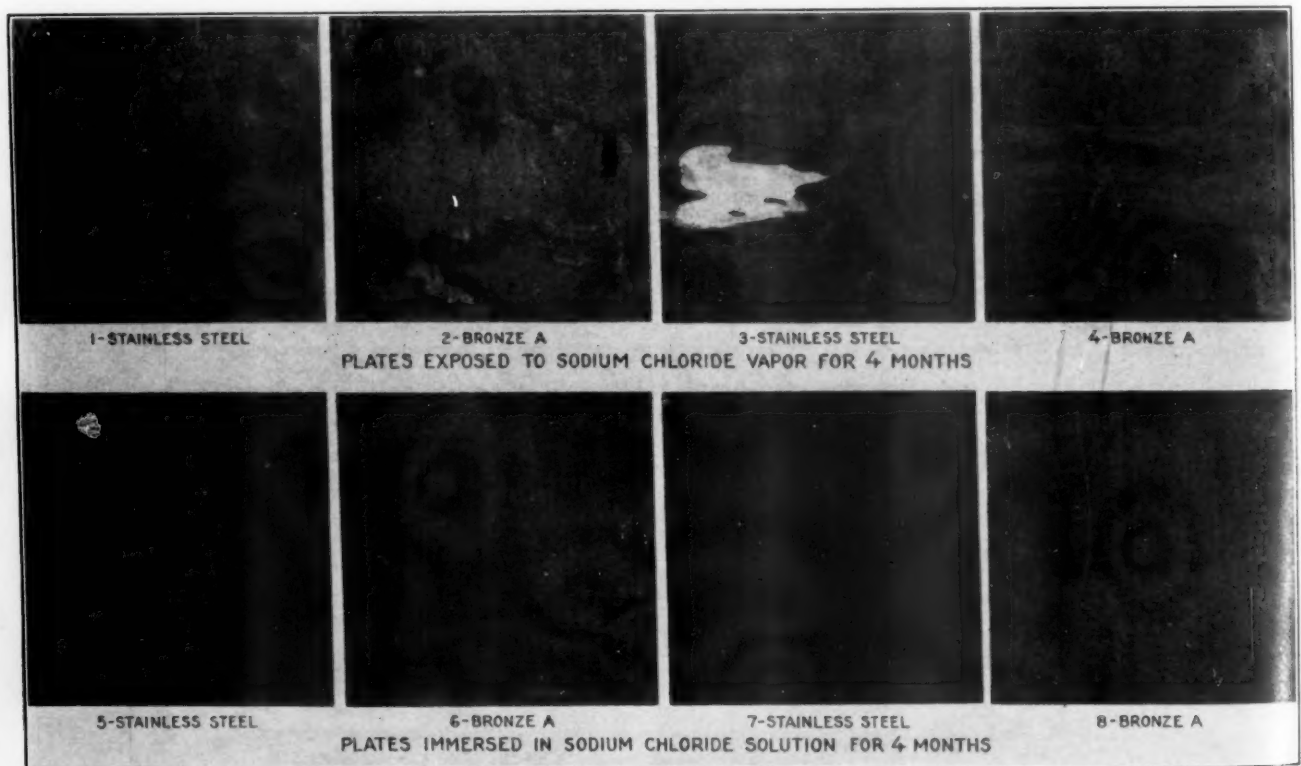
APPEARANCES OF BRONZE AND STAINLESS STEEL BEARING PLATES AFTER IMMERSION IN AND EXPOSURE TO SODIUM CHLORIDE. STRIPS OF WOOD INSULATED THE IRON CLAMPS FROM THE PLATES. NOS. 1, 2, 5, AND 6 WERE CONTACT FACES, AND NOS. 3, 4, 7, AND 8 WERE OUTER FACES OF PLATES.
